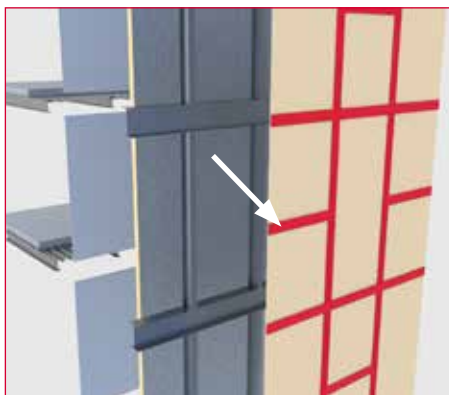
Wraptite Tape used to seal gaps between external sheathing boards.
